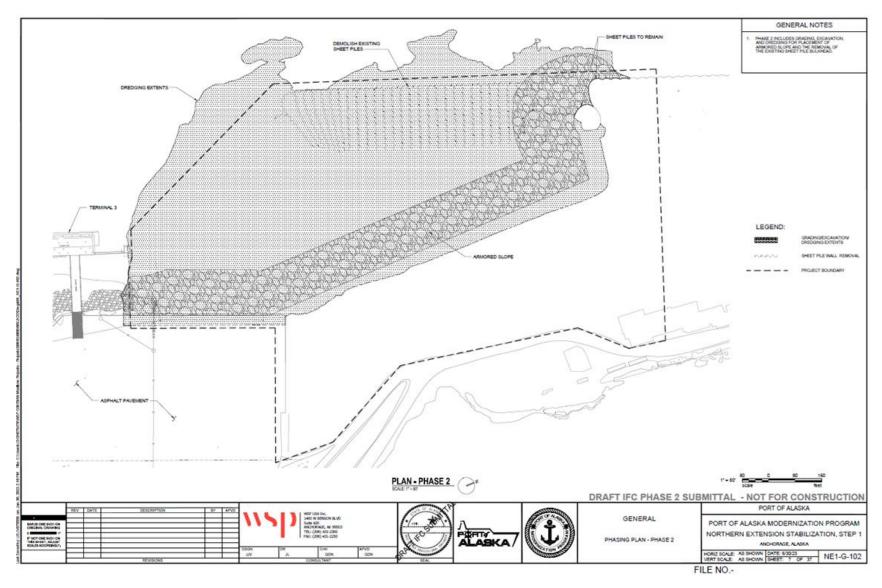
Plan Drawing of the North Extension Upland Areas and Sheet Pile Cells, Bulkhead, and Tailwalls to be Demolished as part of the NES1 Project
